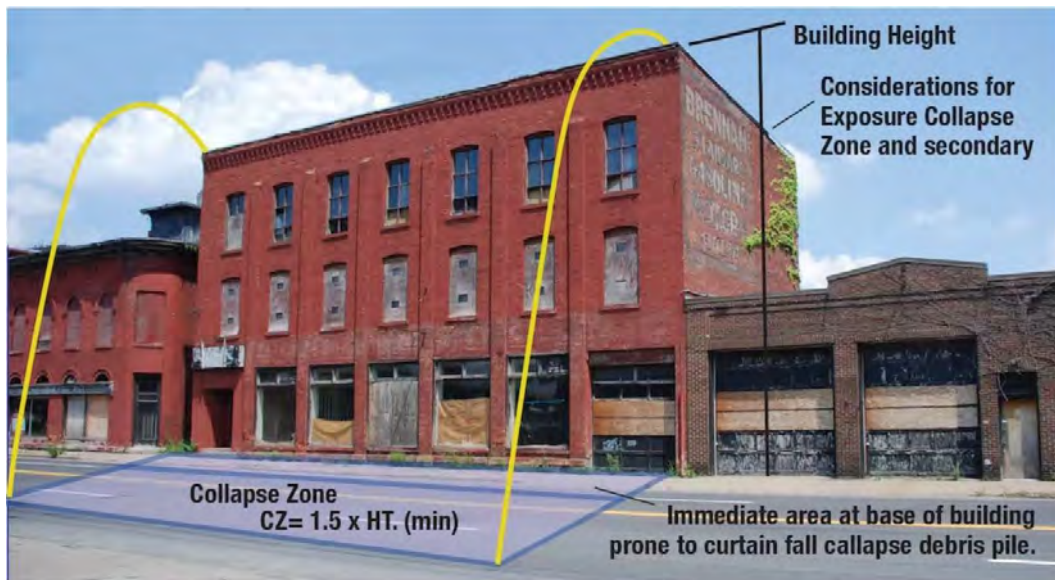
Building height and collapse distance ratio. (Source: Khan, 2004)
